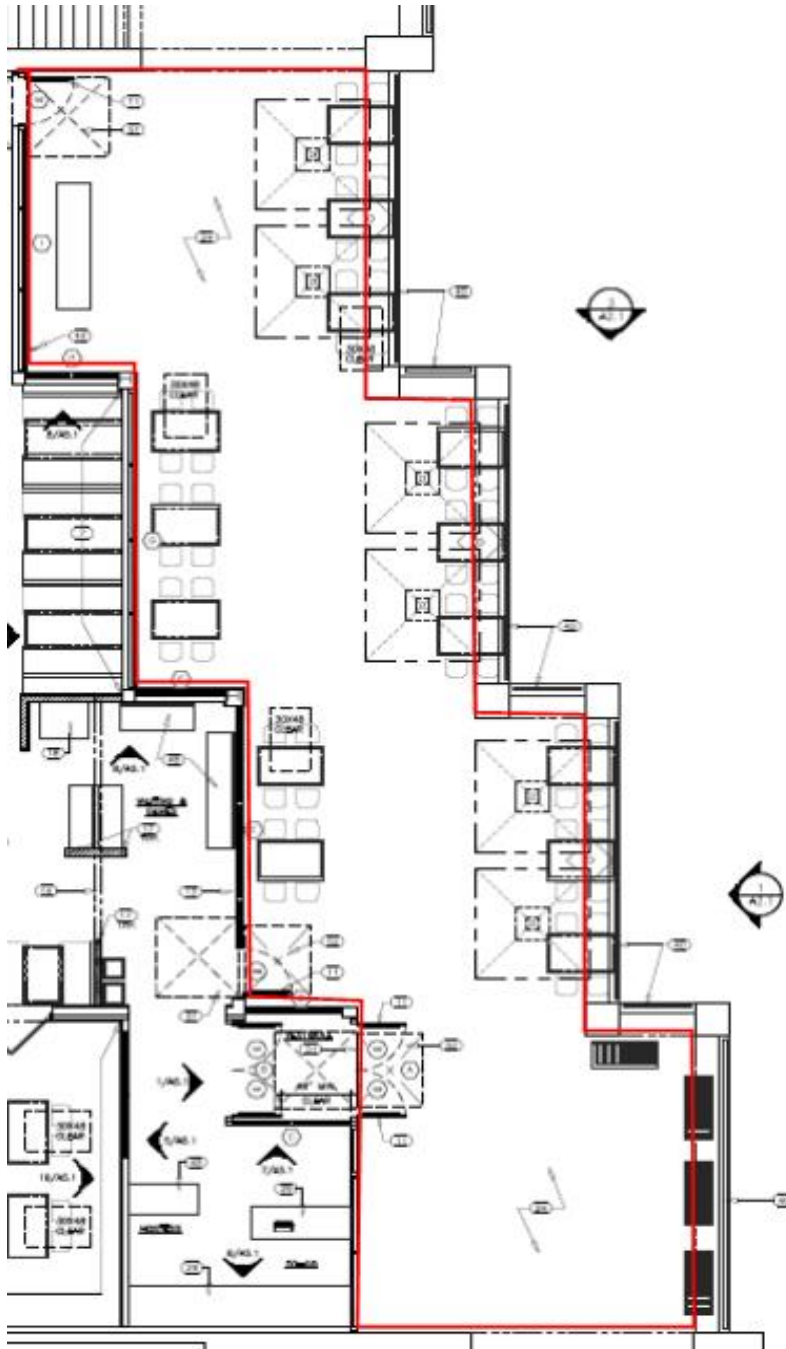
Proposed outdoor seating arrangement for 3141-3147 Duke Street outlined in red.
